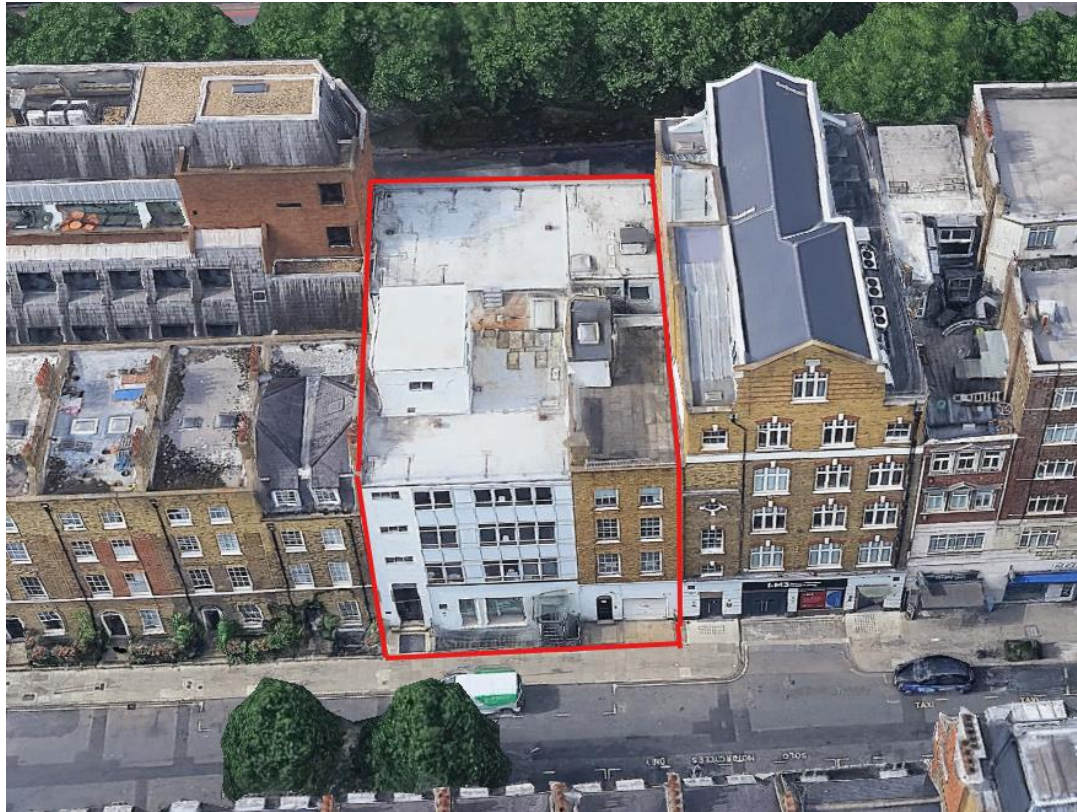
The existing site outlined in red shown aerially from the south with Warren Street in the foreground
